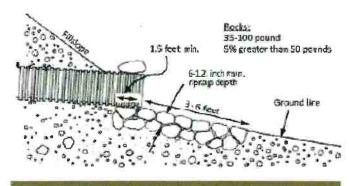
The elements of a properly installed ditch relief culvert. The culvert is angled at about 30 degrees to the road alignment to help capture flow and prevent culvert plugging or erosion of the inlet area. It is set at the base of the fill (ideally) or with a grade slightly steeper than the grade of the contributing ditch (but never with a grade less than 2 percent) (USDA-SCS, 1983). At a minimum, the grade of the ditch relief culvert should be sufficient to prevent sediment accumulation at the inlet or deposition within the culvert itself (it should be self-cleaning) (USDA-SCS, 1983).
